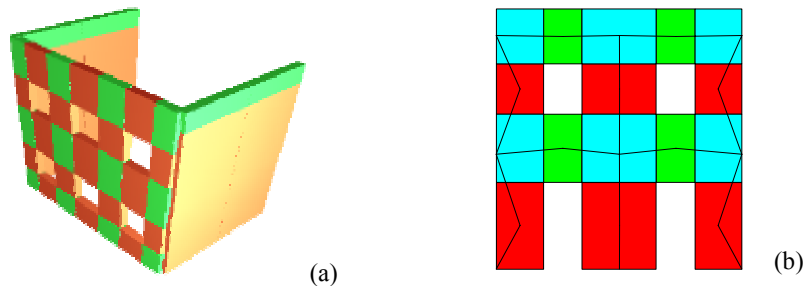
(a) 3D model of window and transverse walls; (b) 2D model of door wall.
